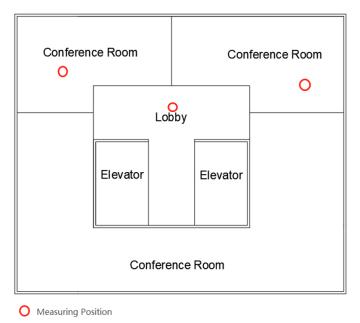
Harrah's New Orleans Hotel 2nd Floor Plan with the Measuring Positions
